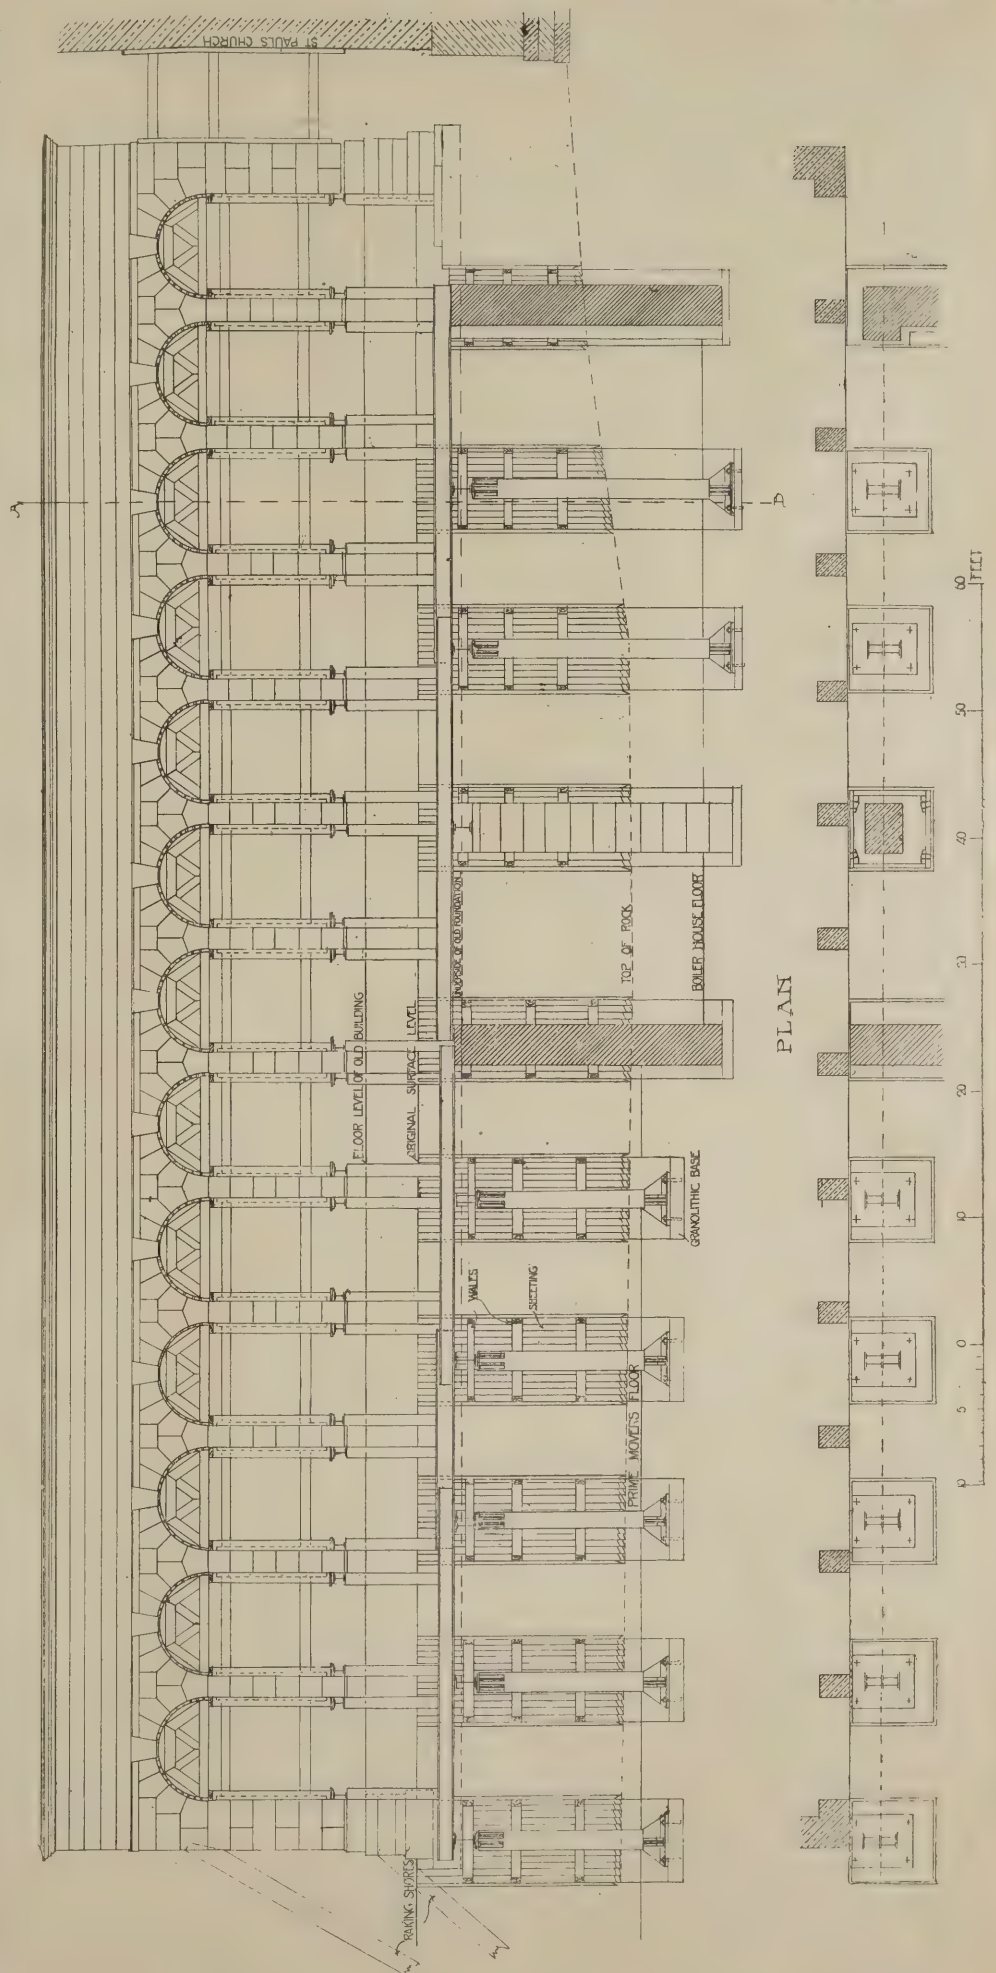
BACK ELEVATION OF OLD ANDERSONIAN BUILDINGS, GLASGOW, SHOWING STEEL STANDARDS CARRYING SOUTH WALL OF BACK WING OF NEW COLLEGE BUILDING.
